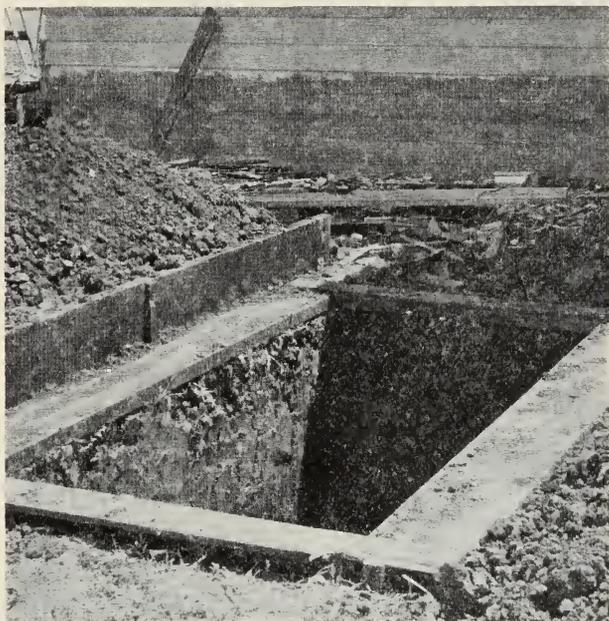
The 2 × 10 inch planks laid about the hole are later used as baffle boards.
